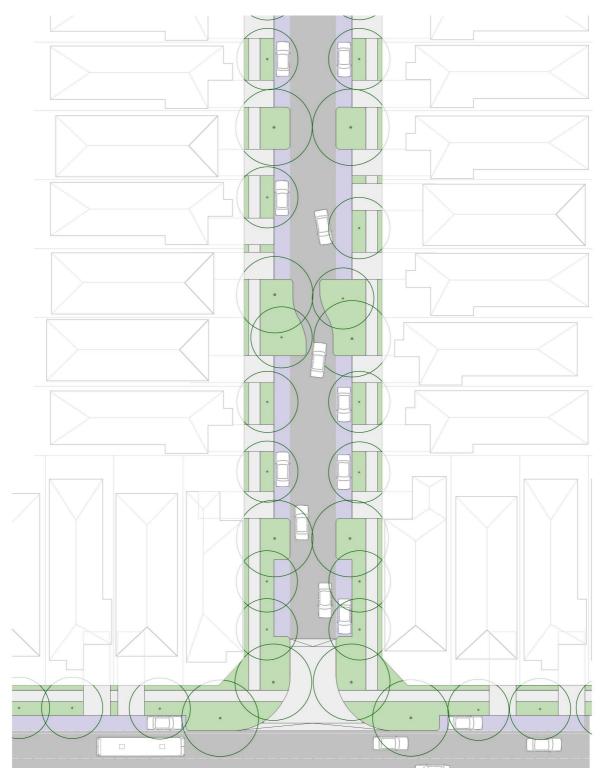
Indicative neighbourhood street plan (1:200 @A4 scale)
